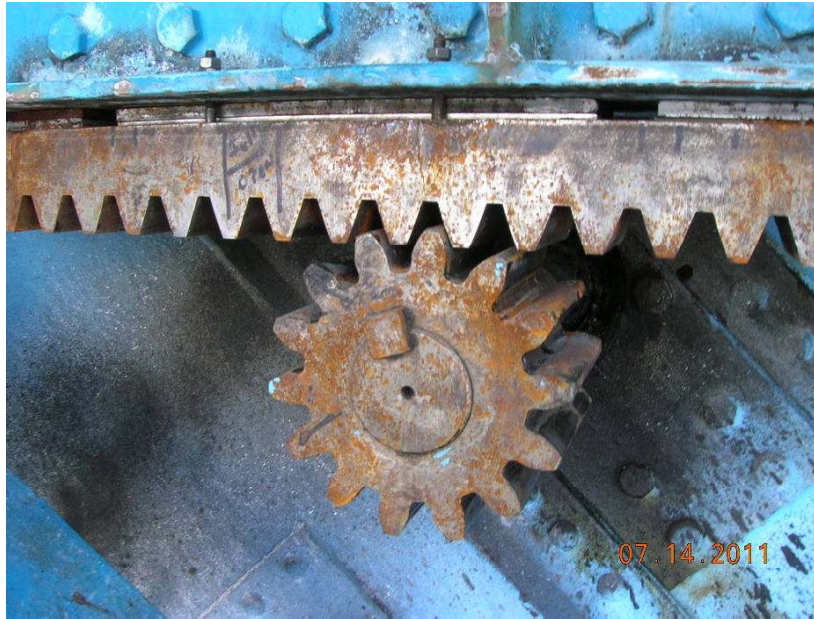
540/4 Open Gearing & 542/4 Shafts
